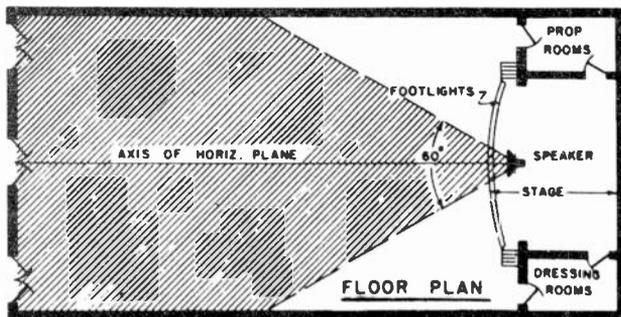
Floor plan showing speaker location in typical theatre installation.
